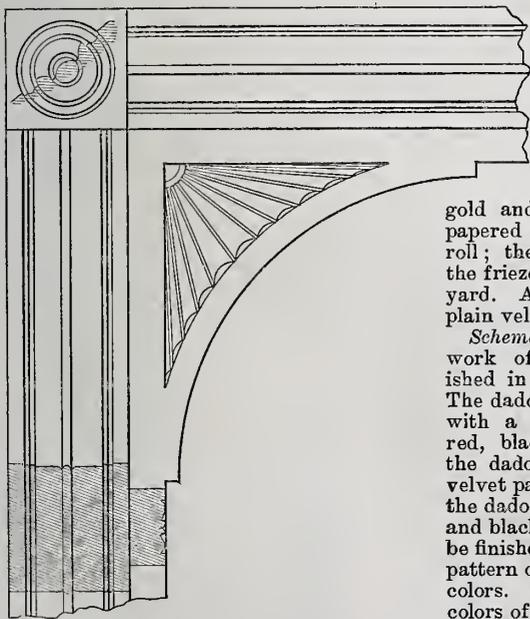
Detail of Arch Finish to Bay Window and over Sideboard.—Design B.—Scale, 1½ Inches to the Foot.
